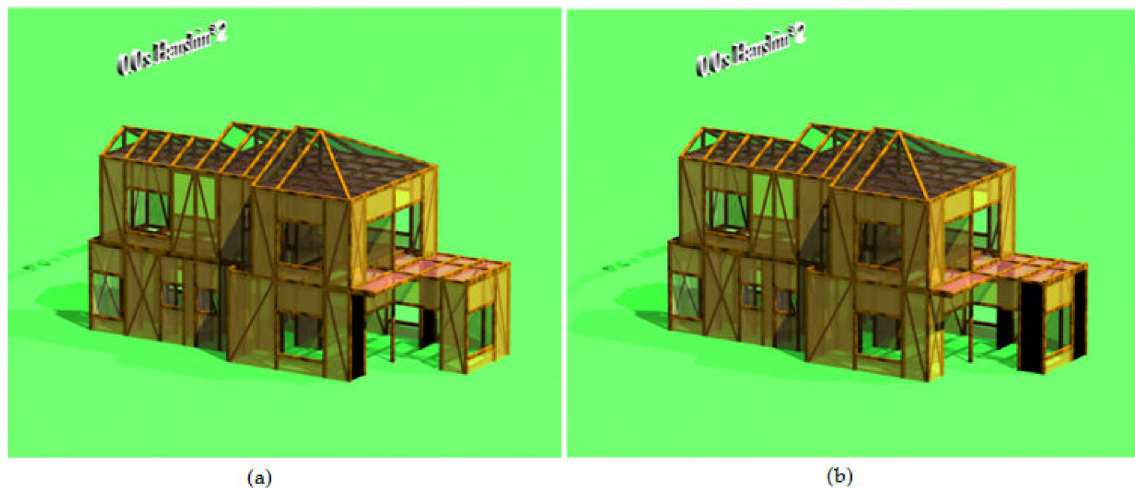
Two examples of reinforcement plans of the wooden house. The walls shown in black are reinforced by diagonal braces and structural boards
